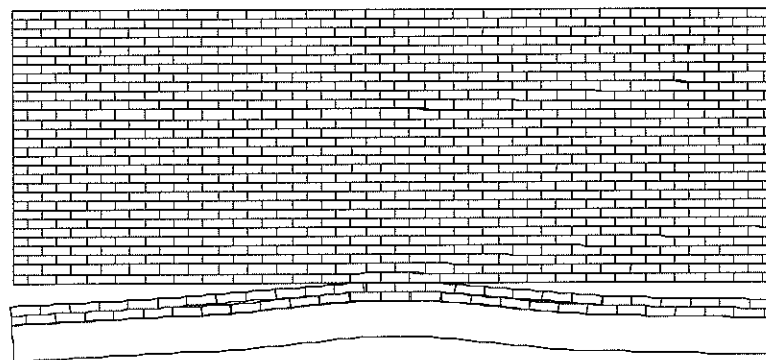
shows the computed crack initiation, progressive development and the wall movements for the doming case modelled with DEM. The crack initiated at the ends of the joint containing the damp-proof course (dpc) (Figure 9(a)). Separation then taking place and extended as the upward displacement increased to around 3 mm (Figure 9(b)). Finally, when a central doming deflection reached 7 mm, the wall
